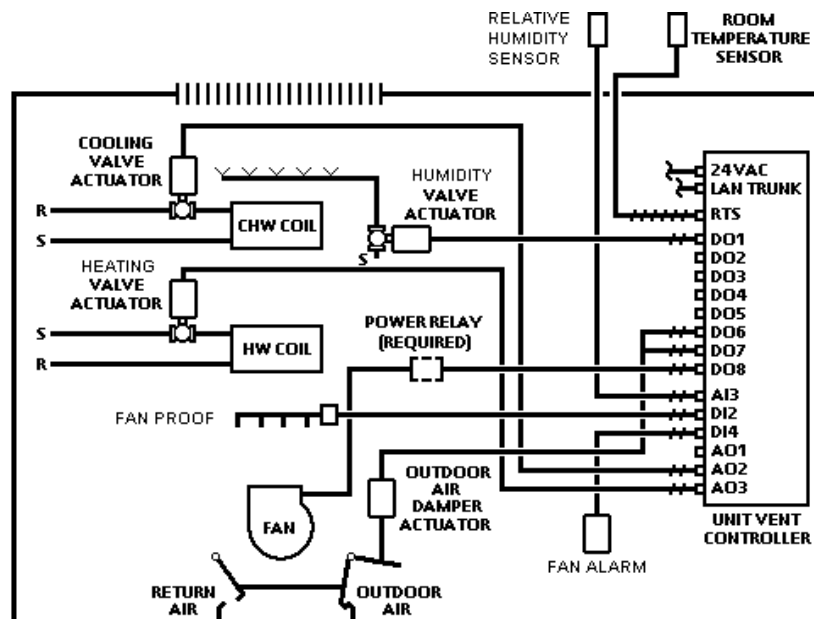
Application 2306 Control Drawing with Heating and Cooling Coils, 2-Position Damper, and 2-Position Humidifier.
